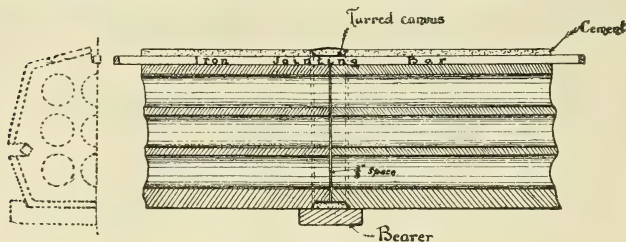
Method of making Joint in Concrete-Block Conduits
